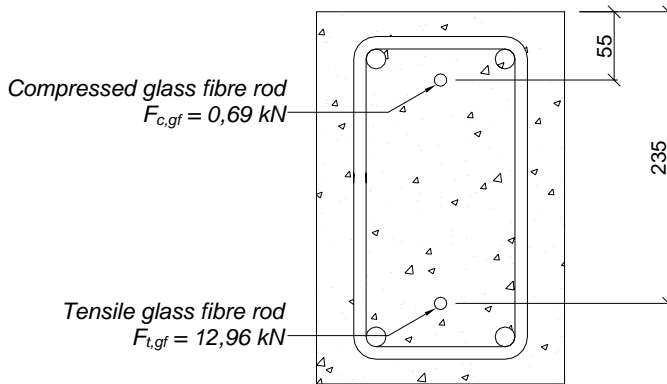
Beam cross section with glass fibre rod location and forces at yielding of tensile steel reinforcement.
